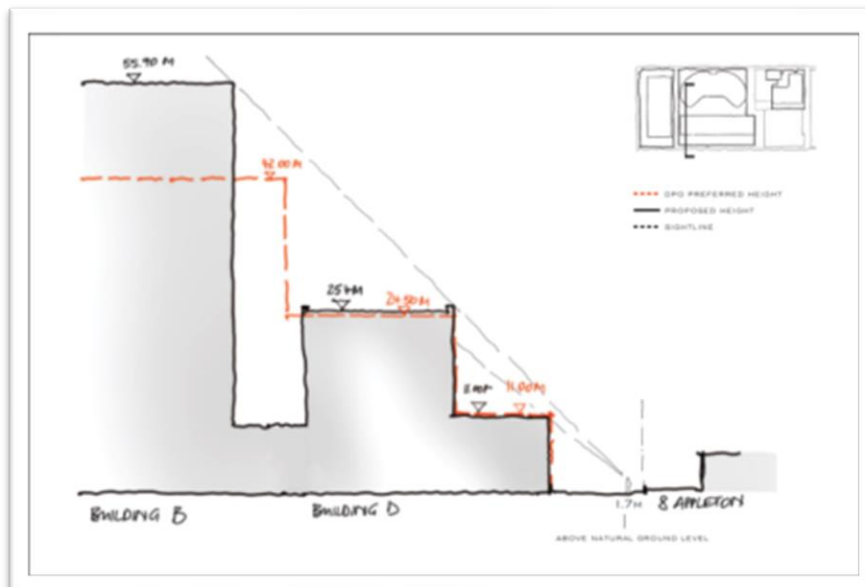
Sightline diagram from Appleton Street to Building B. Source: Development Plan (Gurner 2023)
